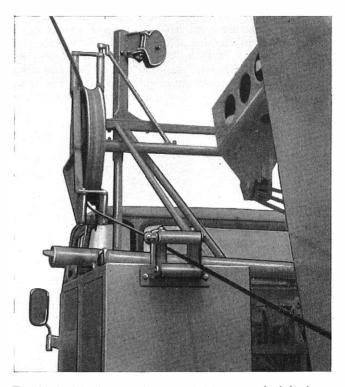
Aerial cable threaded through fairlead and bullwheel, for the "direct placing" method of erection
